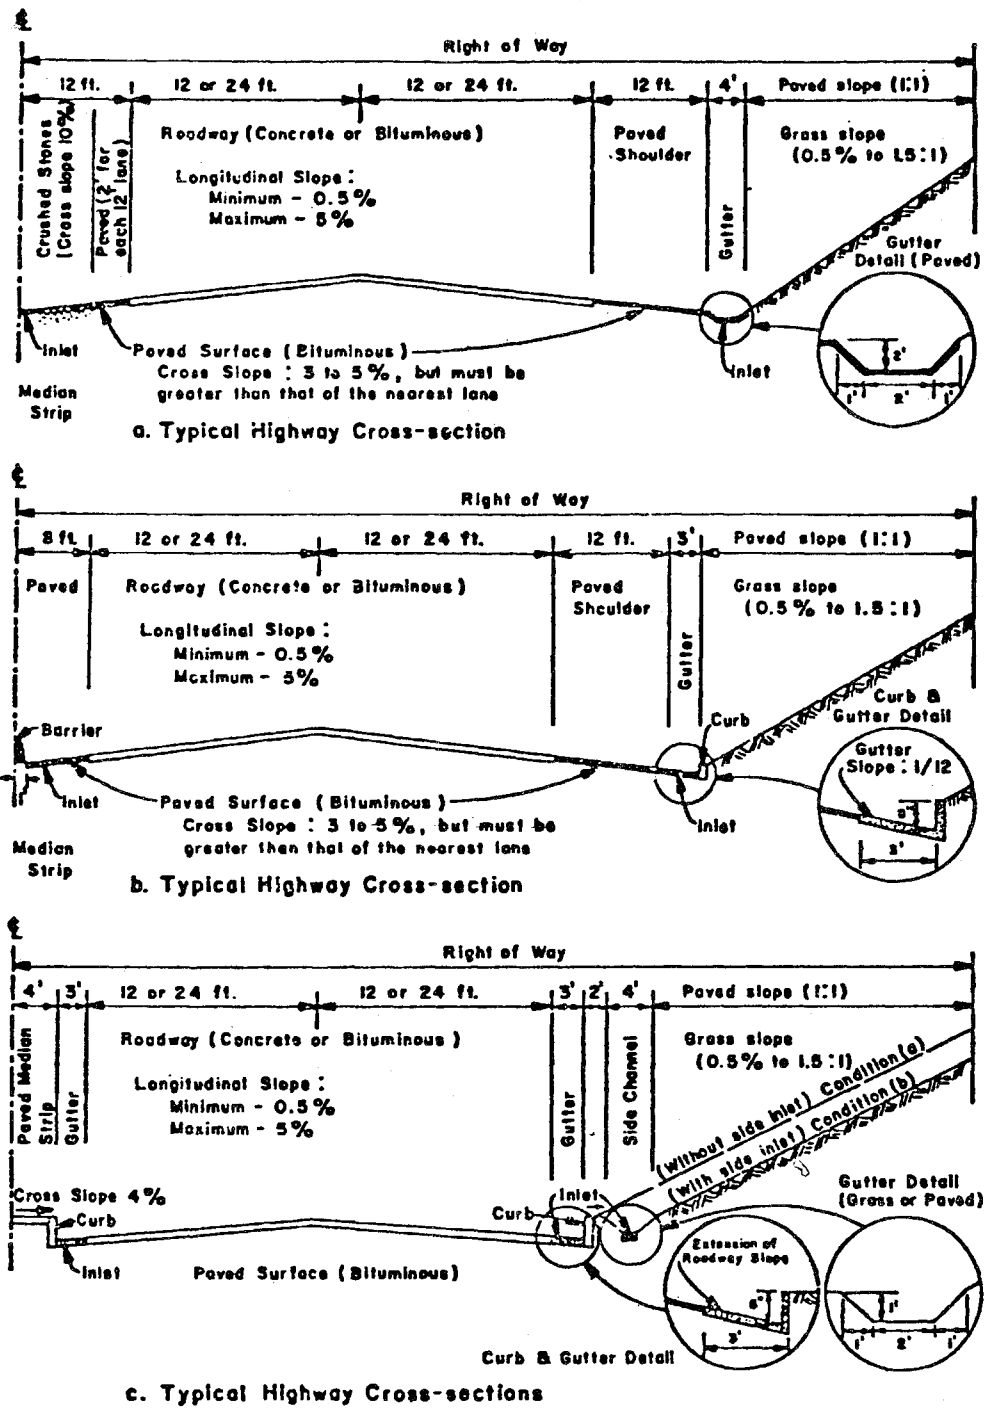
Schematic Diagrams of Typical Urban Highway Cross-Sections.
